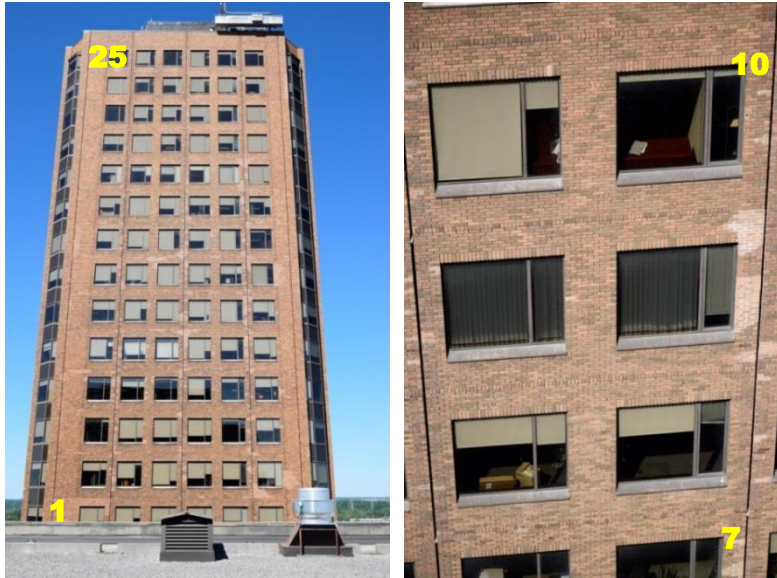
Elevations of Block 200 showing East façade of levels 12 to 25 (left) and details (right) of recent repairs along levels 7 to 10
